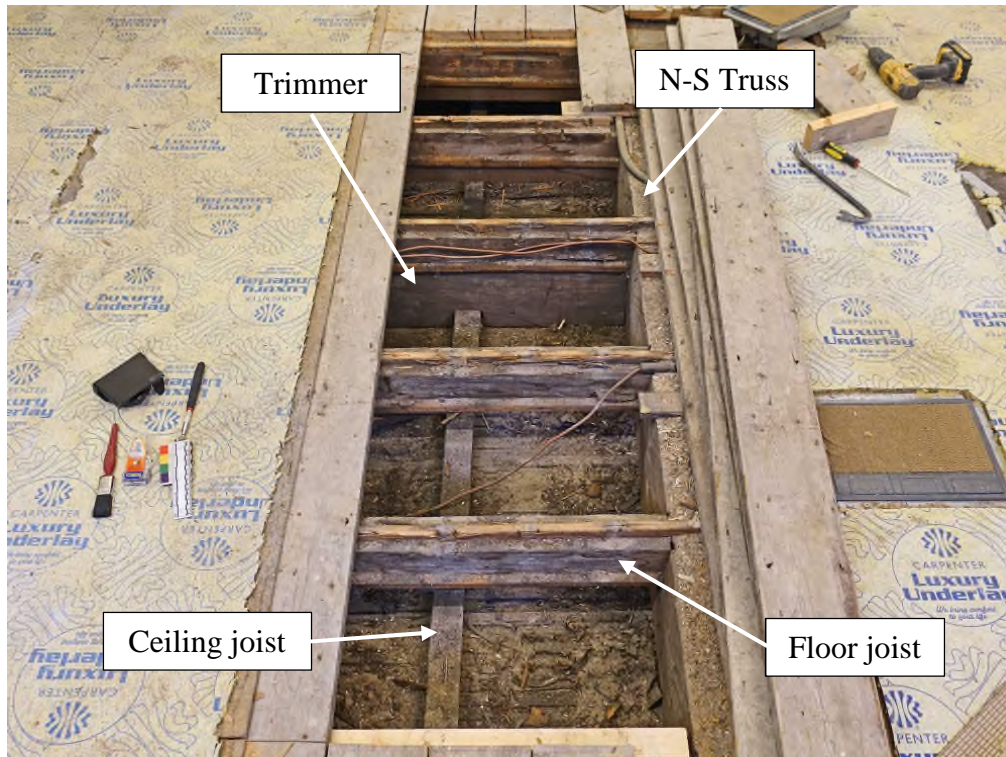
Ceiling back exposed on second floor east room central area 'A'
